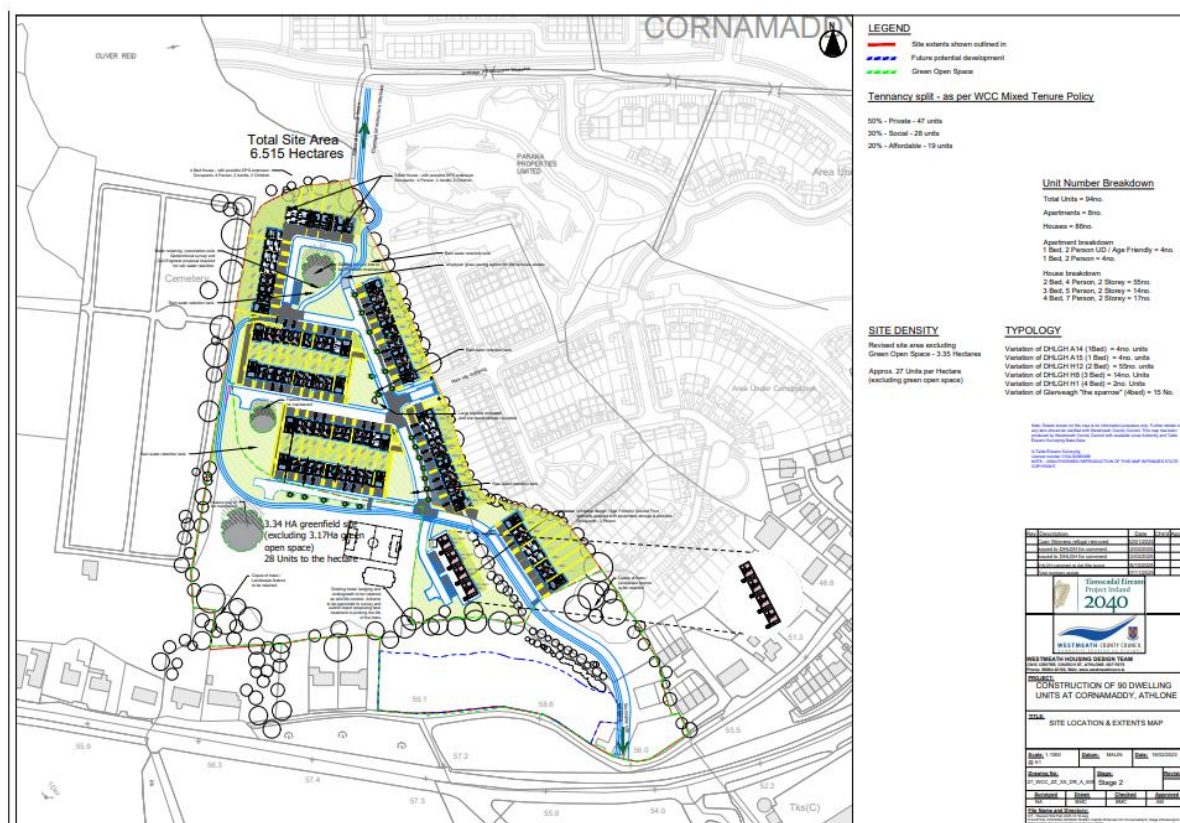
Proposed layout of the residential development at Cornamaddy.
